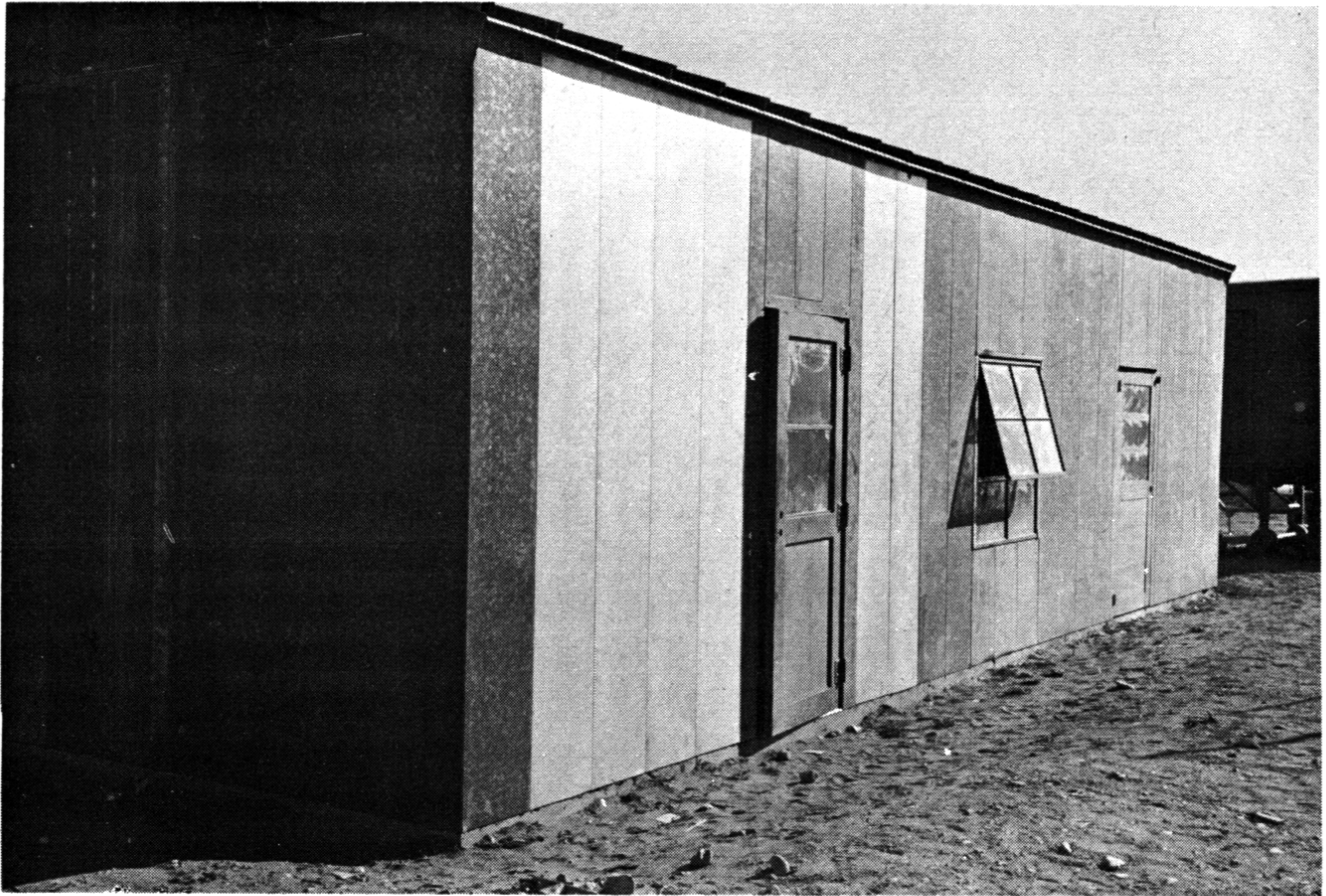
Exterior of self-framing steel panel building before a nuclear explosion, Nevada Test Site.
